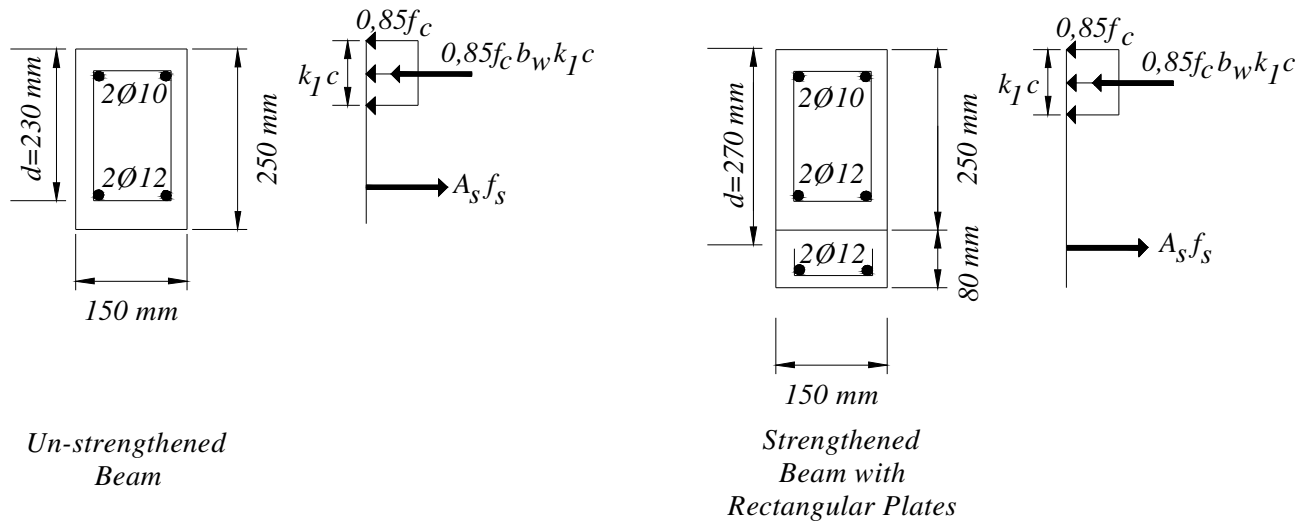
Finding of theoretical failure load for un-strengthened and strengthened beam with rectangular cross-sectional plates.
